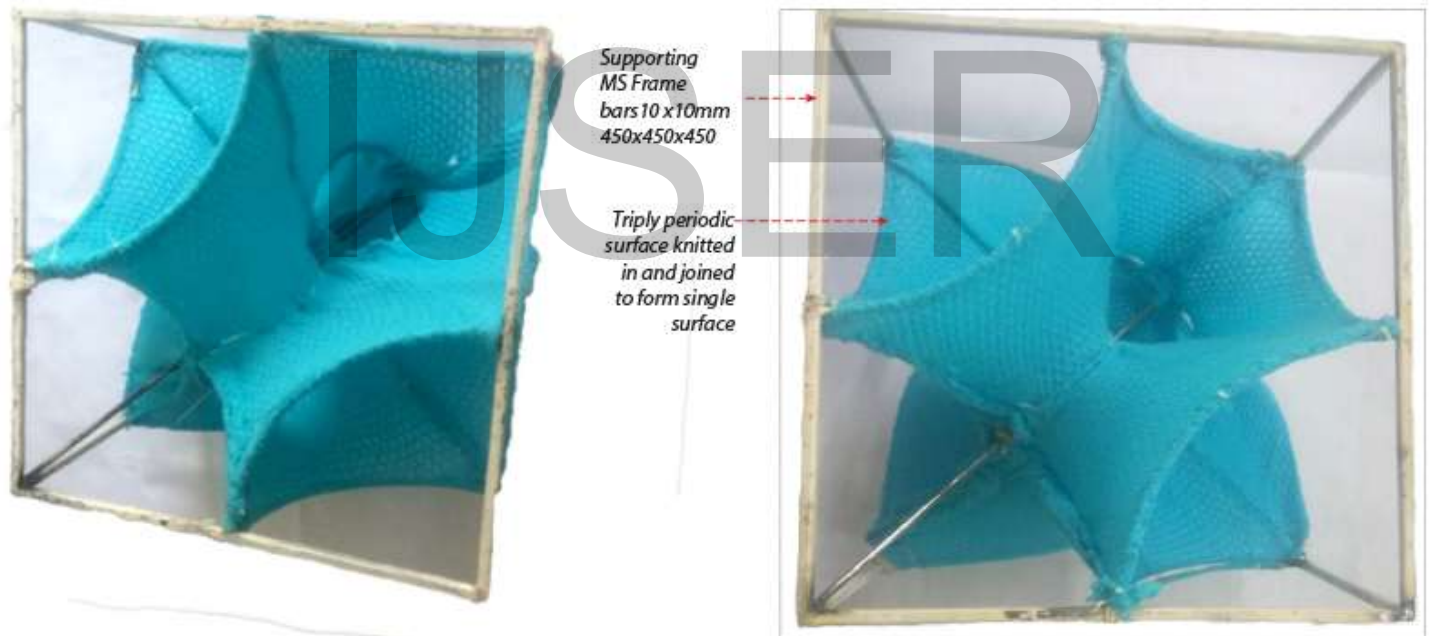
A Prototype completed with Prestressed knitted cloth as stay in place formwork.
